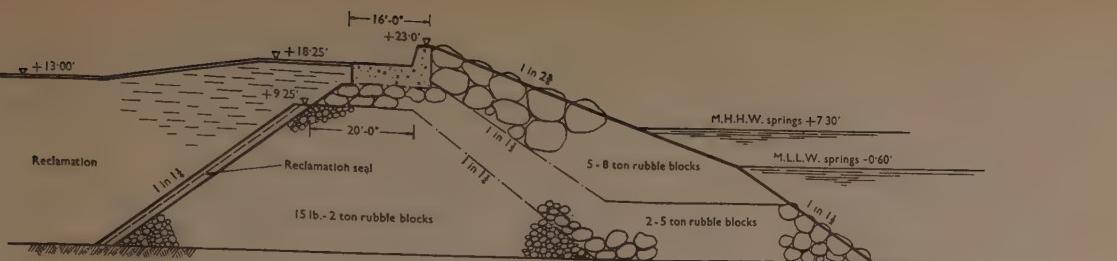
GENERAL CROSS-SECTION OF BREAKWATER
